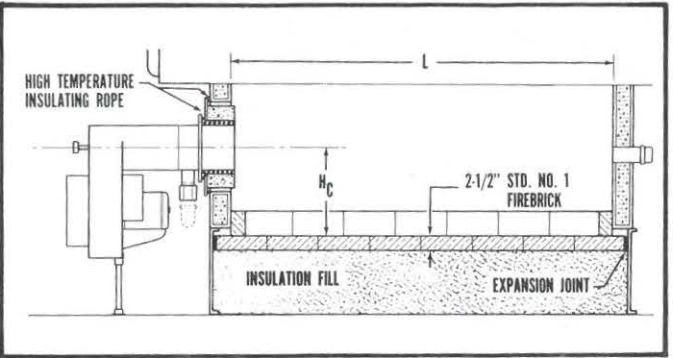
TYPE "F" BURNER INSTALLATION FIRING FIREBOX BOILER THROUGH THE DOOR
